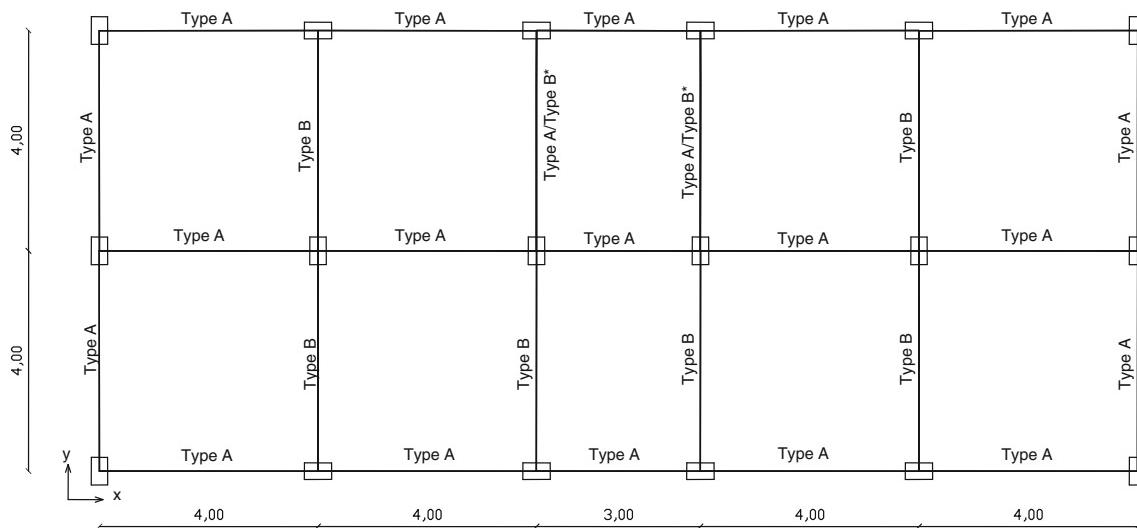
Story view (dimensions in meters). Beam frame labels indicate the section dimensions in cm; column sections are all (30×30)
